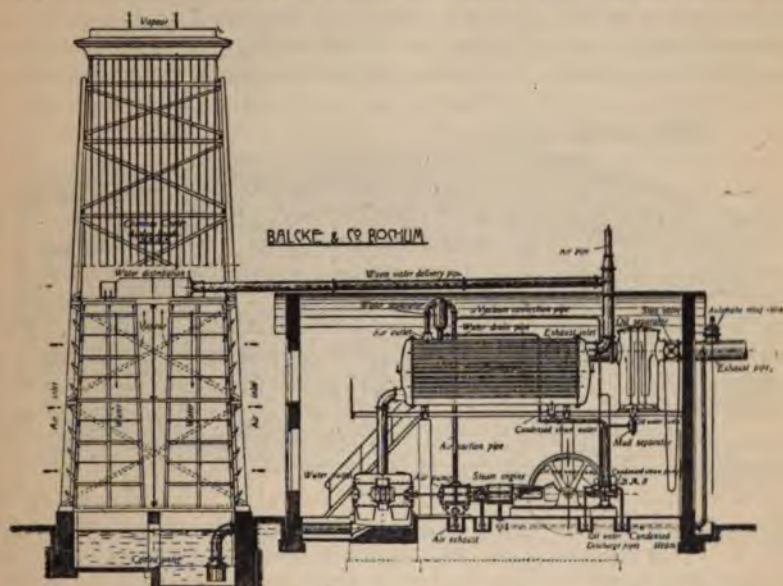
Sectional drawing of Surface Condenser and Cooling Tower, with Accessories.
